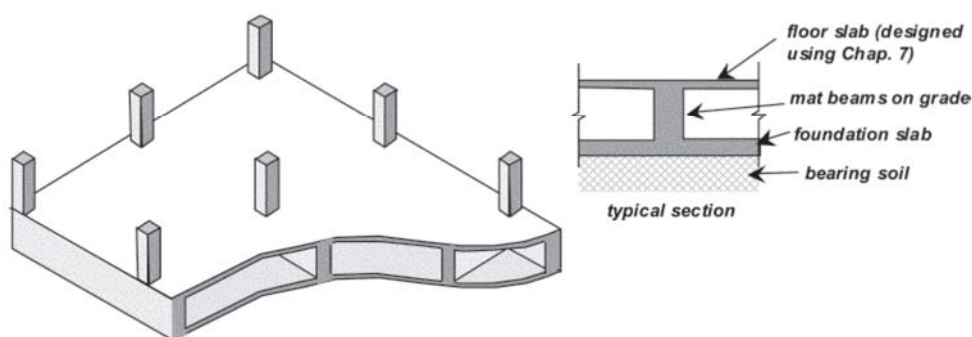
Foundation mat with grade beam on top of the slab.
